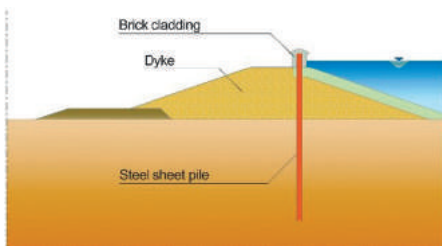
Reinforcing of an existing dyke with steel sheet piles
